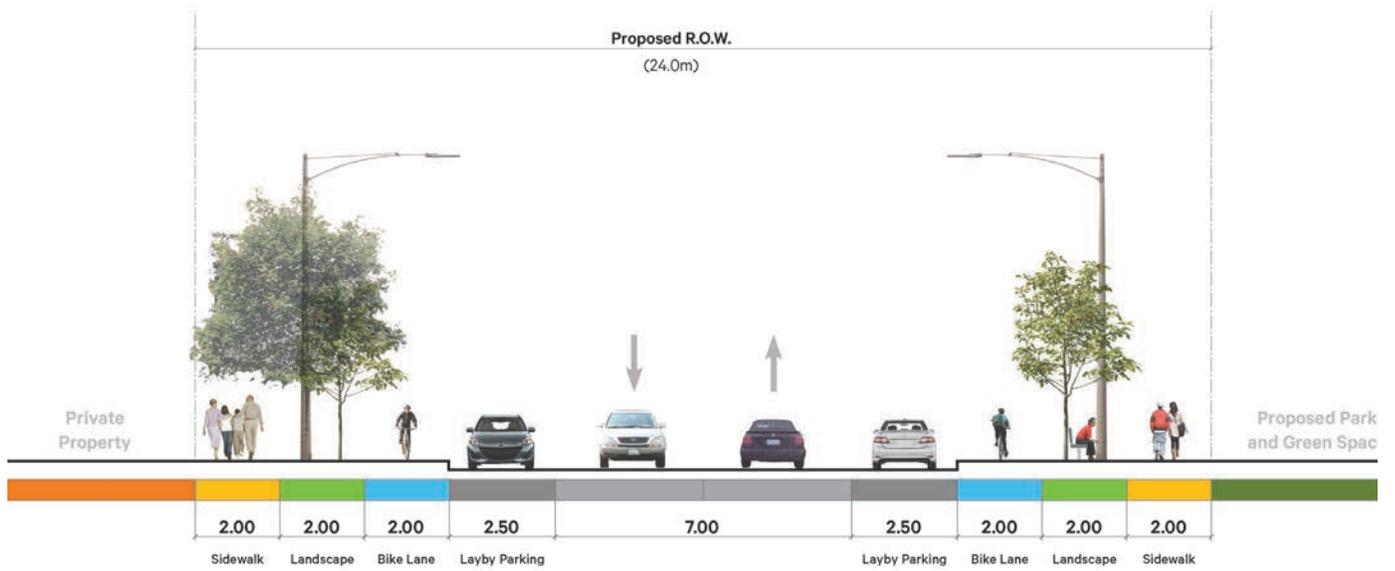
Brock Precinct Streetscape Cross Section - New Private Street from Brock Road to Beechlawn Park or other New Private Streets
